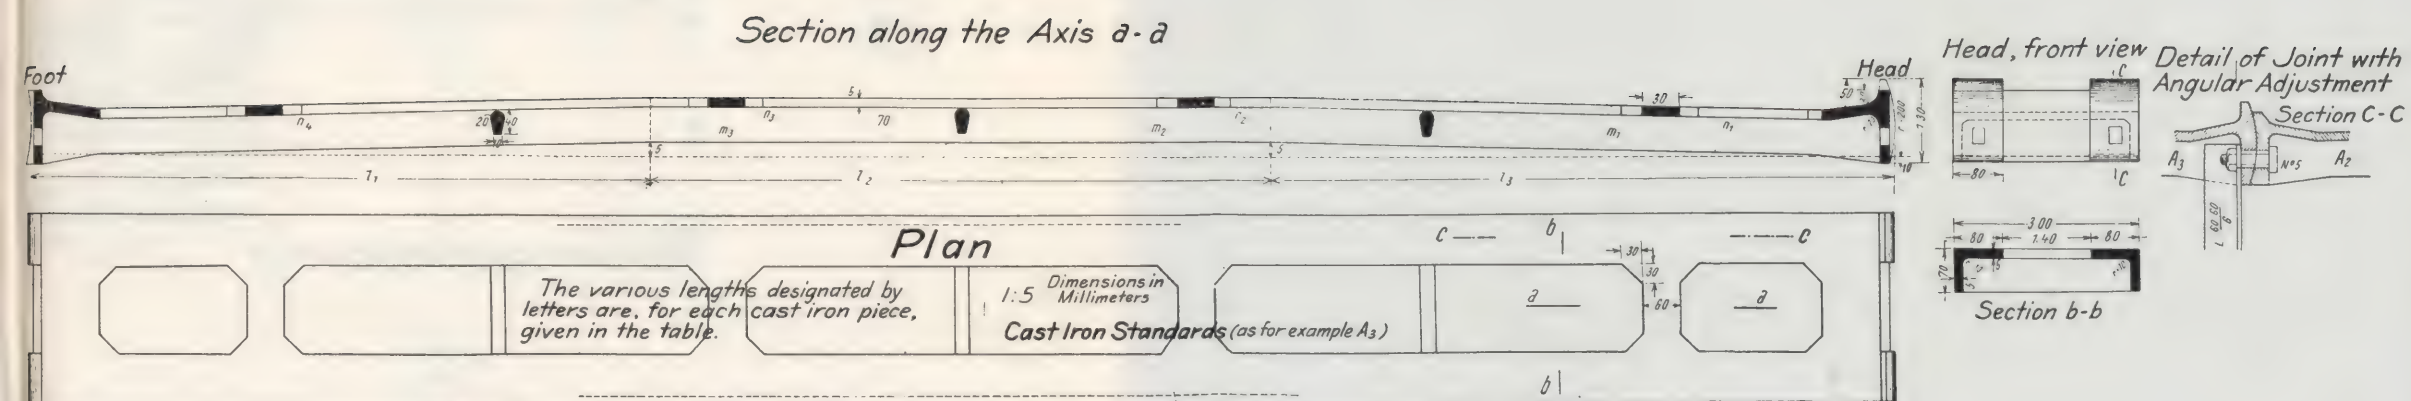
Cast Iron Reinforcement for Bridge of Fig. 14.
